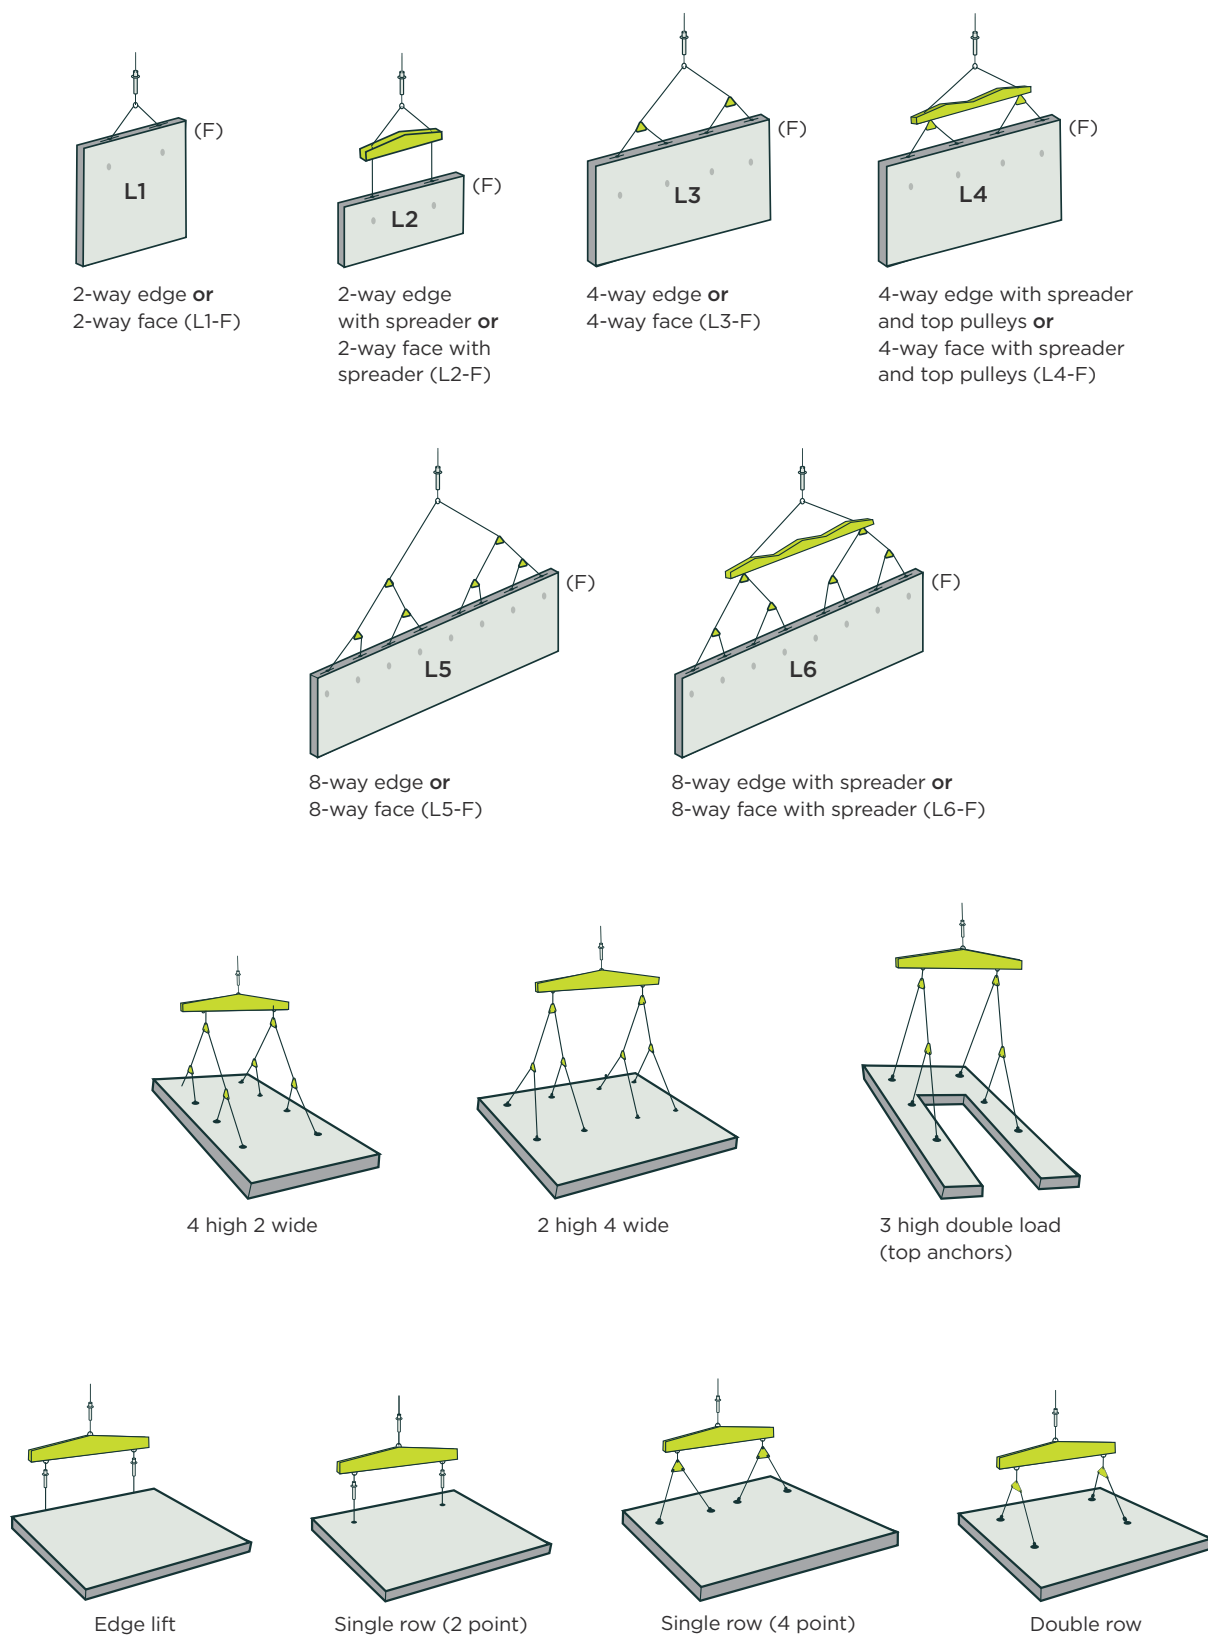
Examples of possible rigging configurations for lifting precast concrete elements¹⁴
